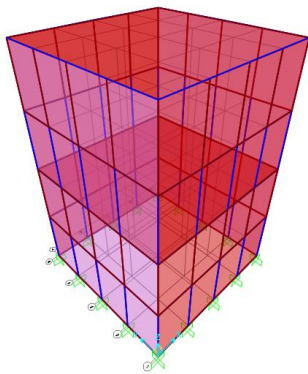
Double storey cross framed Dhajji-Dewari house prepared in SAP-2000.
